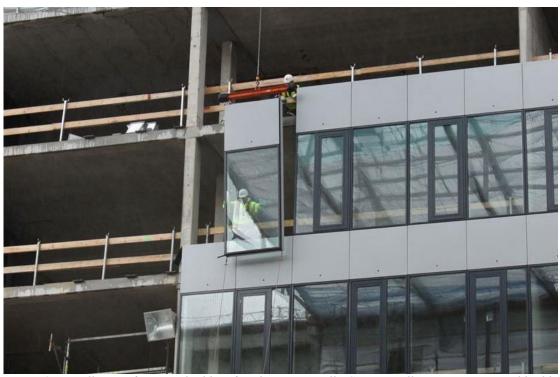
Installation of exterior building façade curtain wall. Curtain walls are non-structural building exterior coverings made from lightweight materials such as glass or aluminum. (Photo Credit: mornglass.com)
